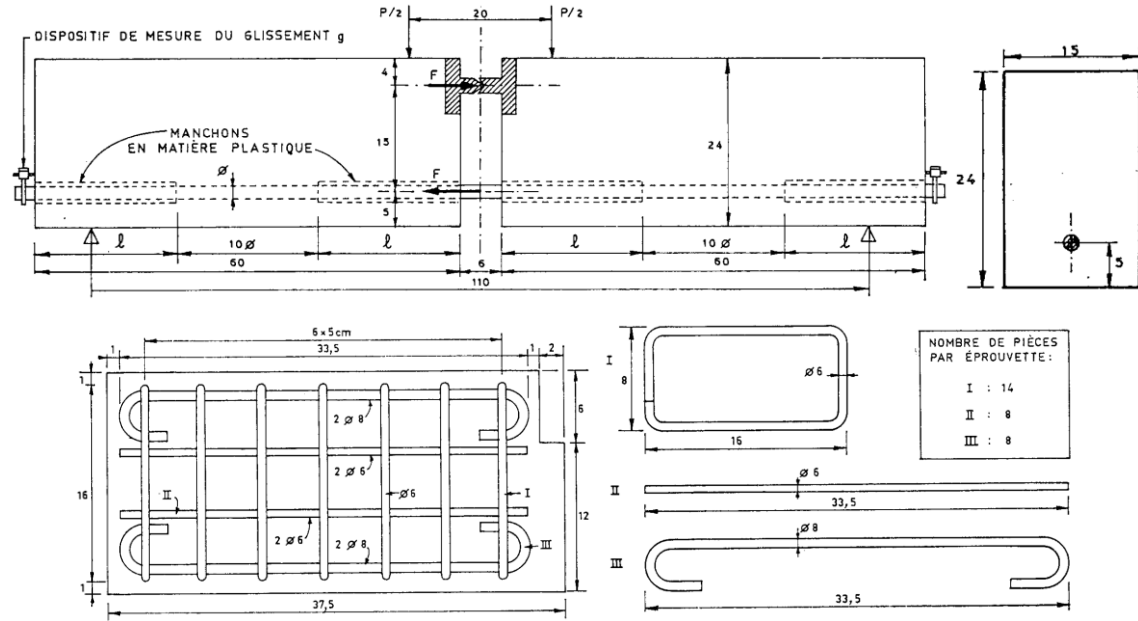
Details of the RILEM beam specimen for two-point monotonic loading
